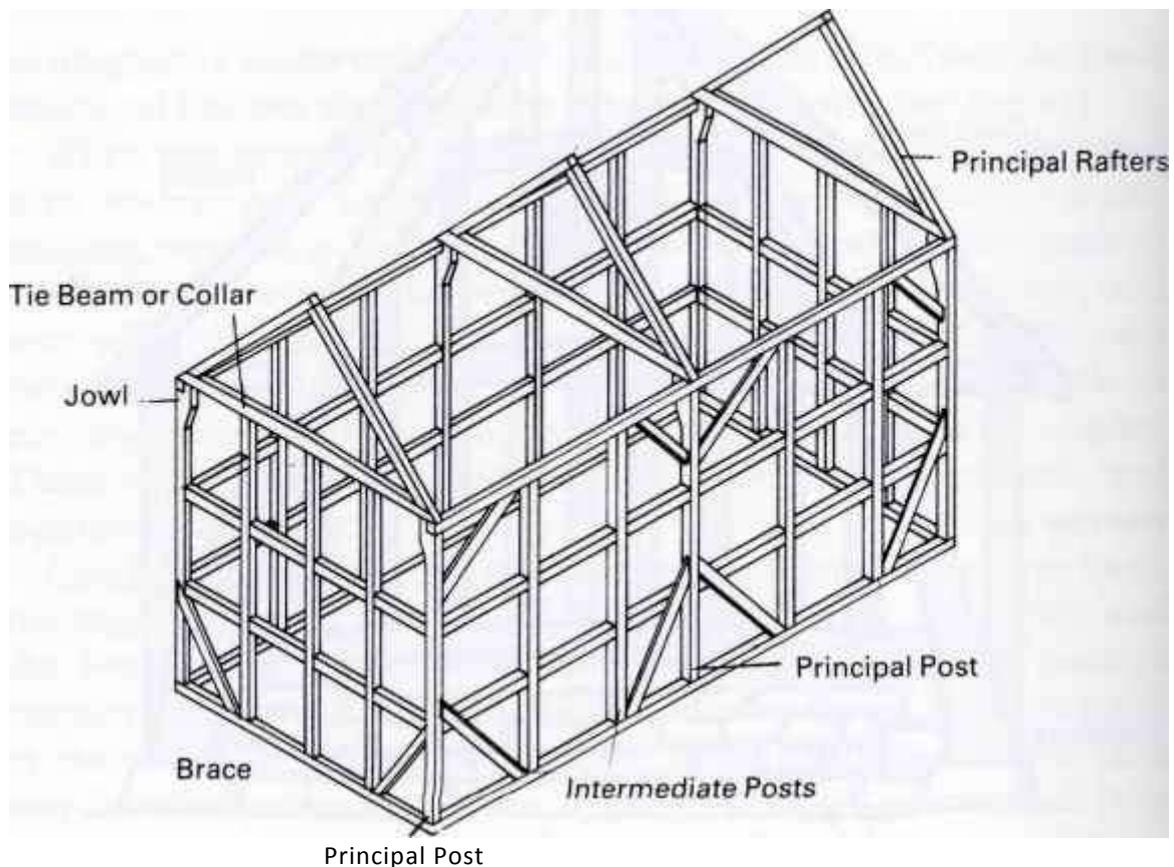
Box frame structure of a typical 17<sup>th</sup> century house (Brunskill)
